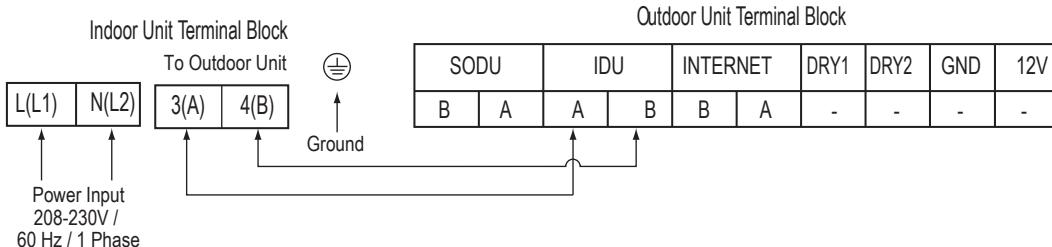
Simplified View of Indoor Unit Terminal Connections—SV Wall-Mounted Frames.
